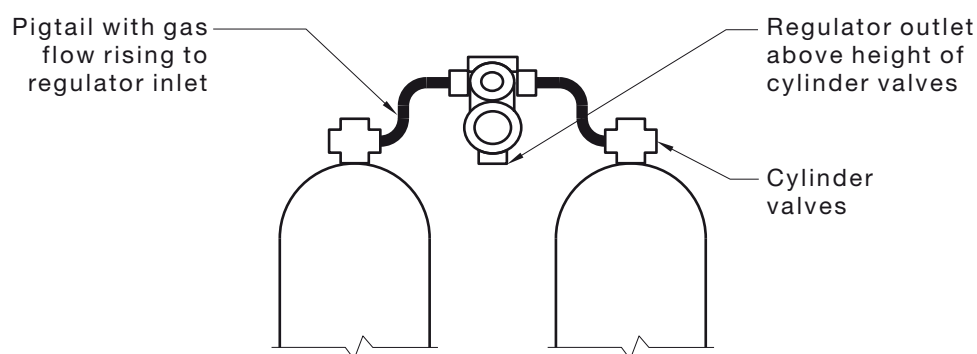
LOCATION OF CYLINDER REGULATOR
